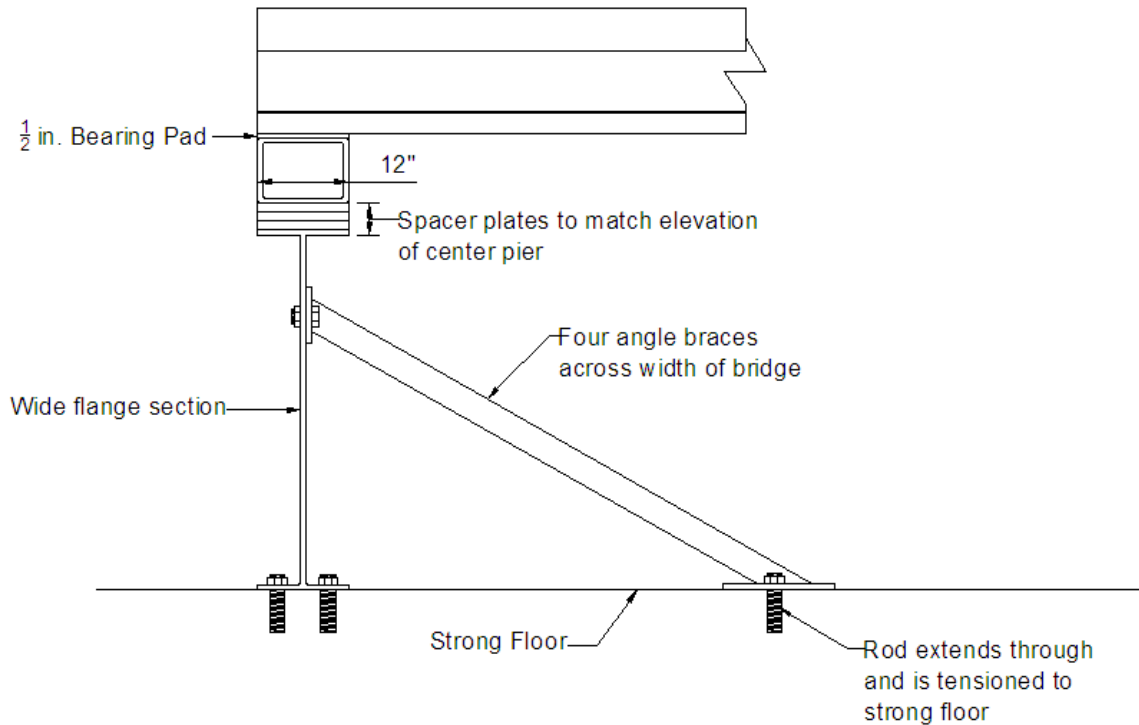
Support and bearing detail of the end supports of the laboratory bridge specimens
